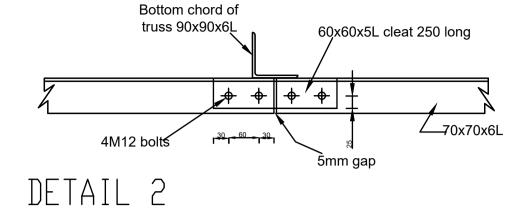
LONGITUDINAL TIE FIXING DETAIL
